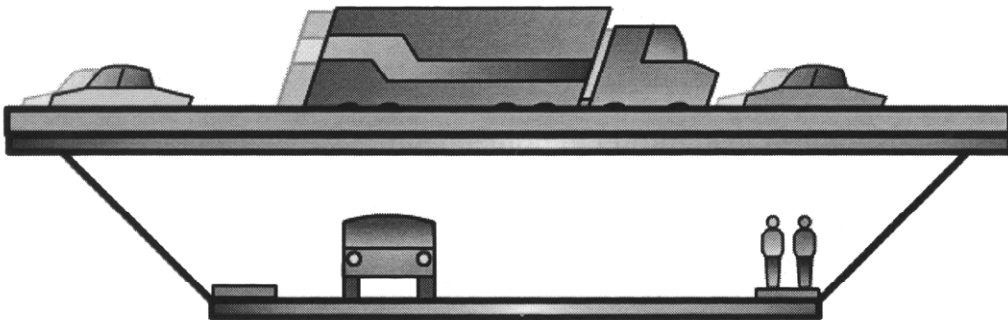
Undercrossing Bridges: Bridges which allow highway mainlines to cross over local streets, lower volume roadways, railroads, waterways or pathways. Example: Bridge No. 55049 and 55050 (TH52 over TH14 West)
